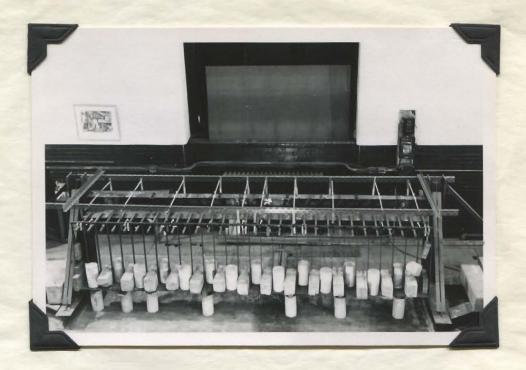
PHOTO I. Overall front view showing load jacked up and resting on concrete cylinders.
